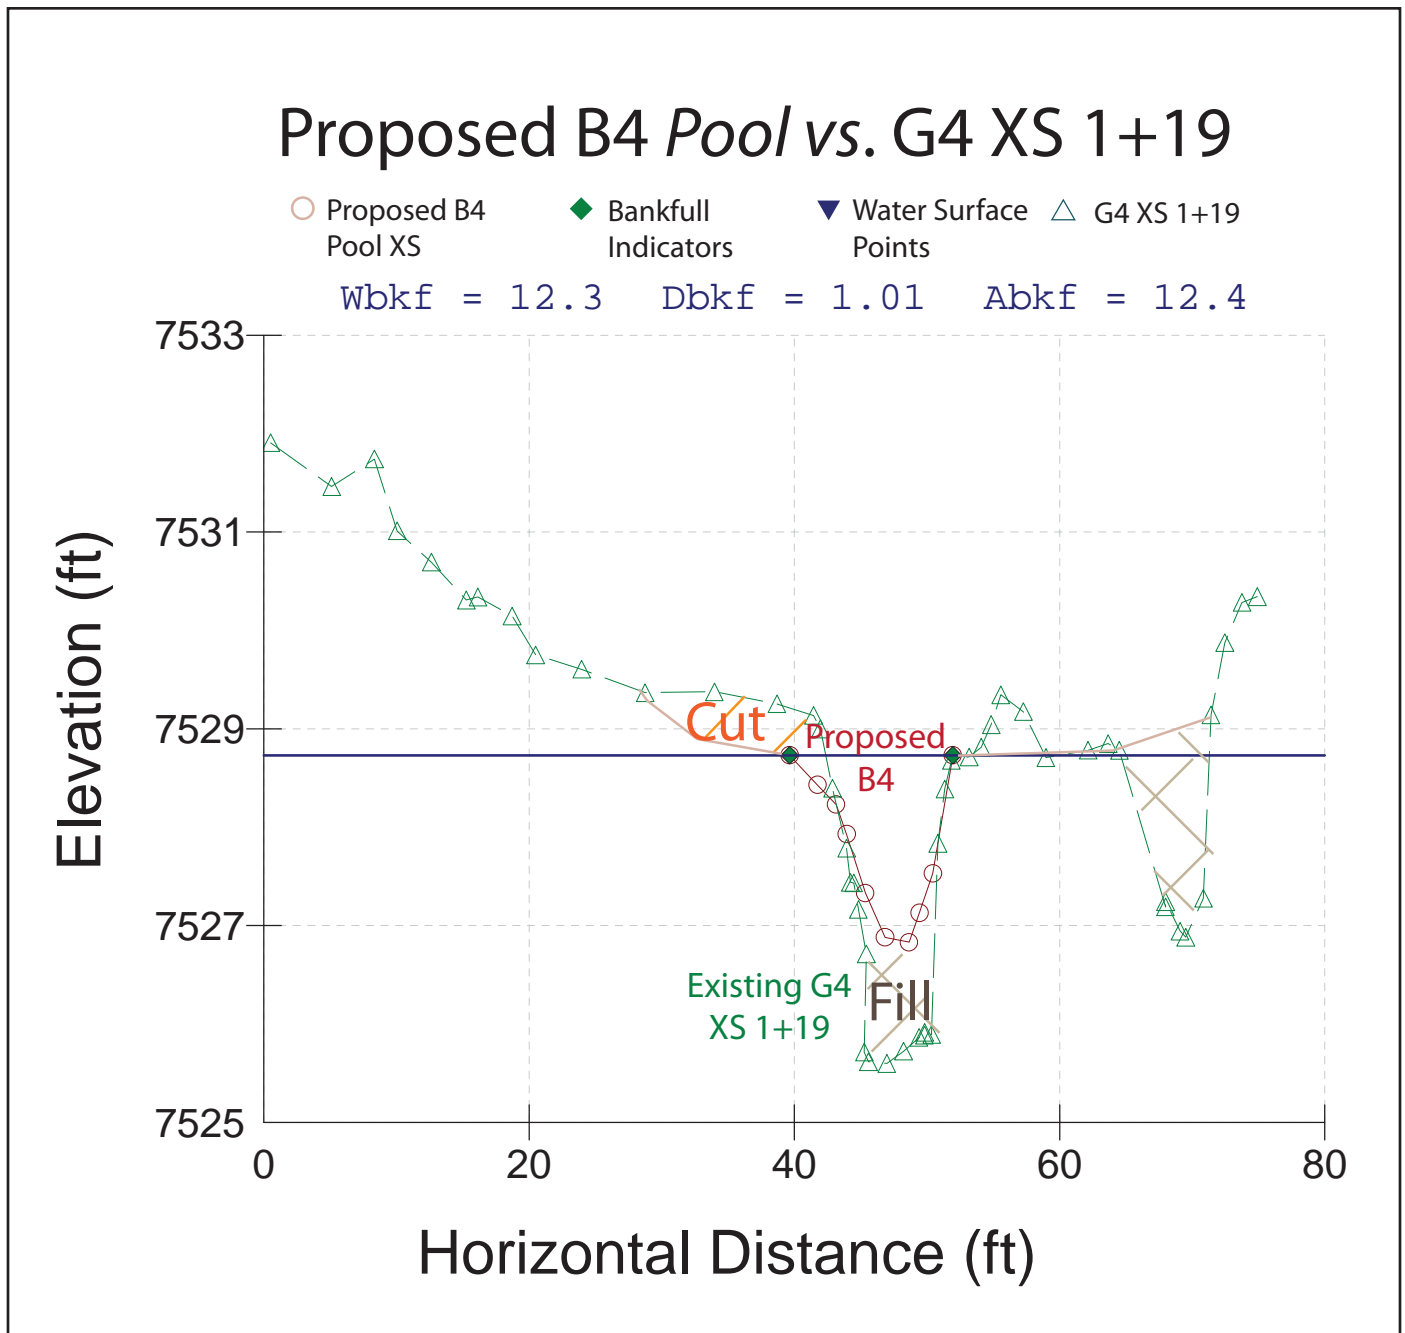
The proposed B4 *pool* cross-section compared to the existing G4 cross-section 1+19, indicating the cut and fill requirements and new bankfull elevation.
